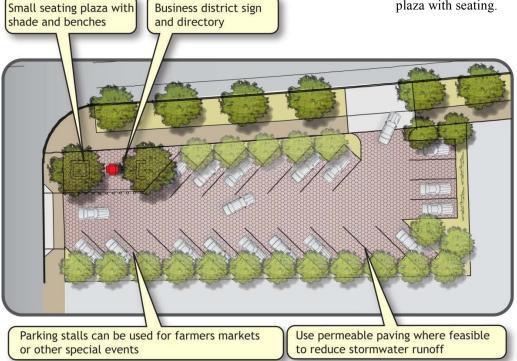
d: Illustrative plan drawing of a District Parking lot.
